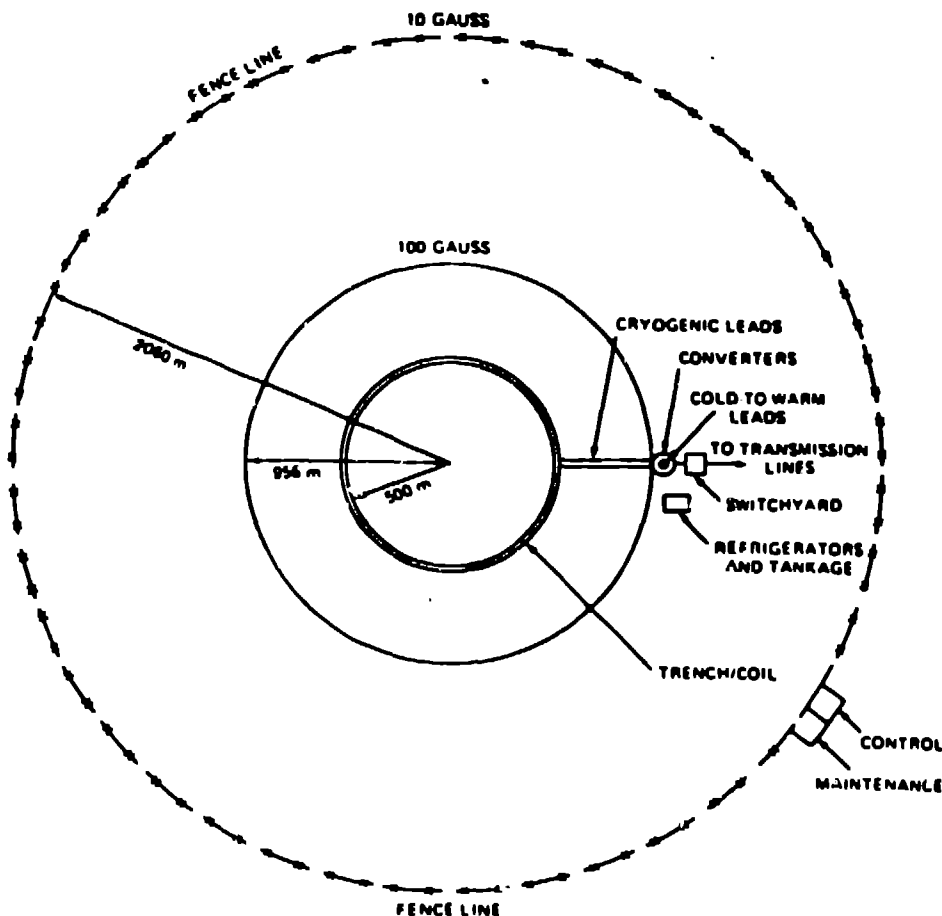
OVERALL PLAN VIEW OF THE 6000 MWH SMES PLANT
